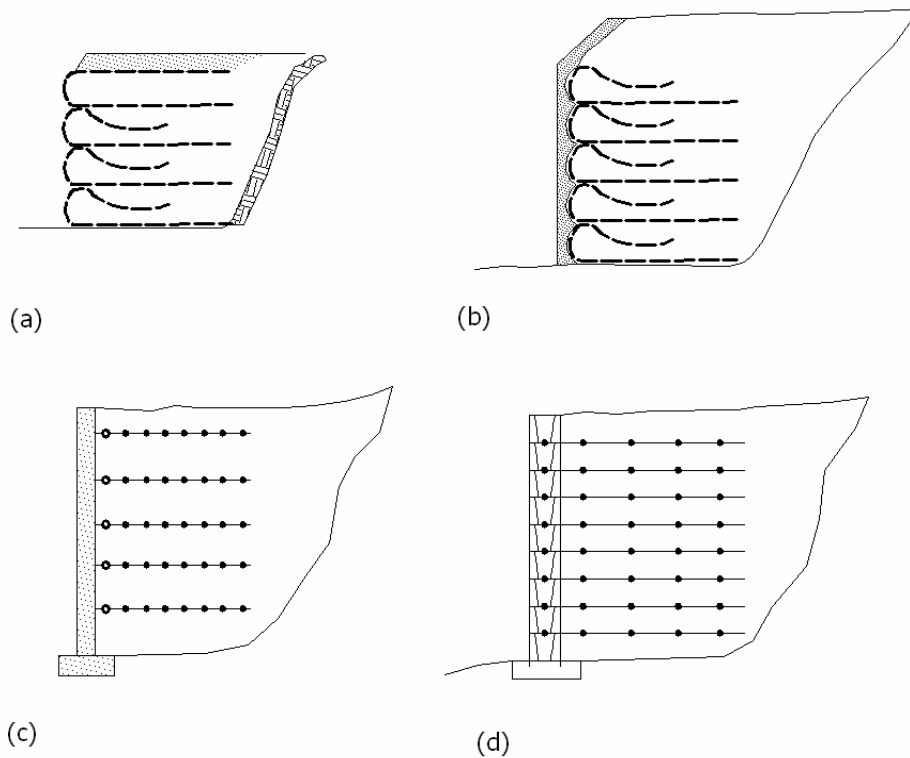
Schematic overview of reinforced retaining walls using geosynthetics
